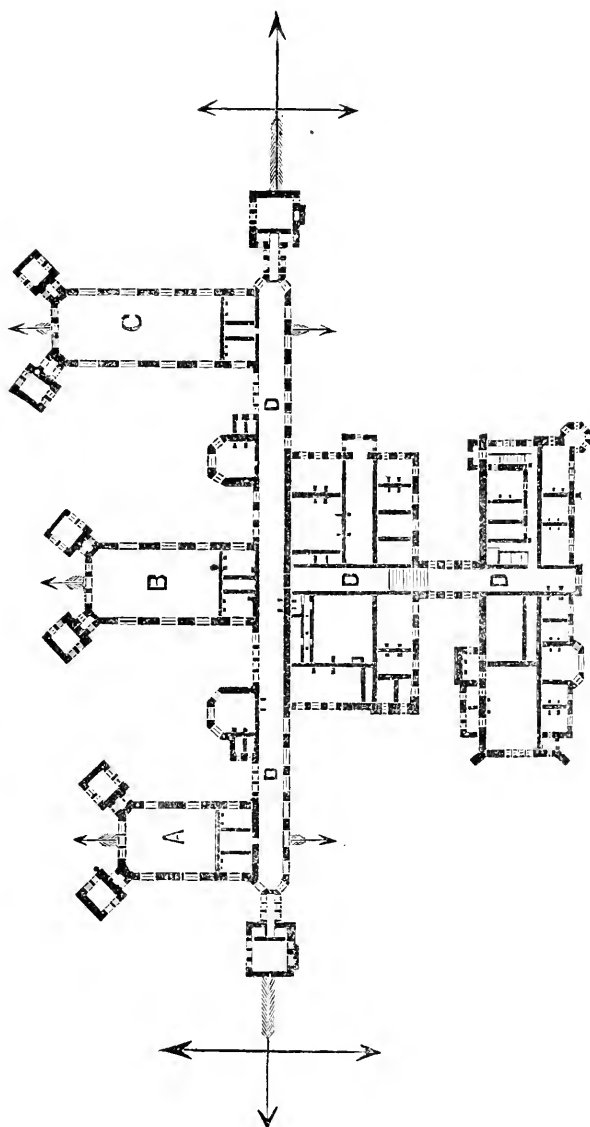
gives the plan of the *Rotherham Hospital*, built in 1872. This is one of the best and most complete small hospitals in England. The buildings are of stone. The pavilions are one story high, and raised some distance from the ground, and sixty feet apart. The water-closets and baths are in the small projections at the free ends of the wards. The small buildings at the ends of the corridors are wards for special cases, and the two between the pavilions are wards for convalescents. The pavilions contain respectively twelve, ten, and eight beds.
